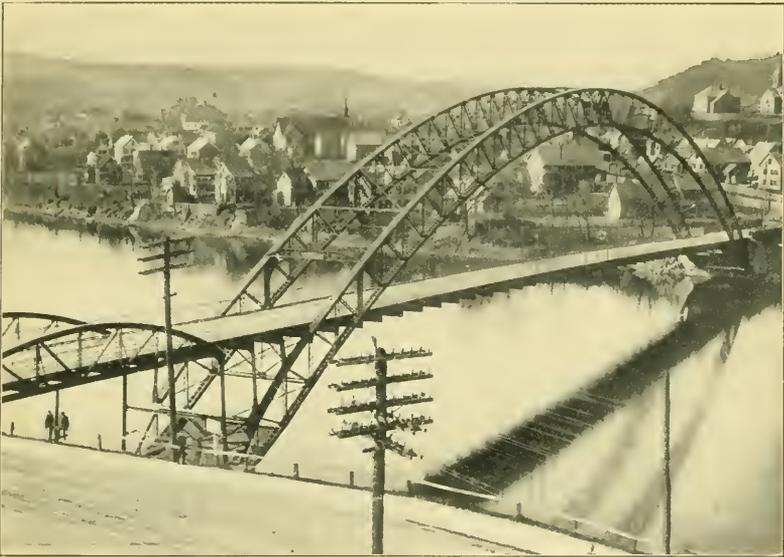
THE BELLOS FALLS ARCH BRIDGE.
